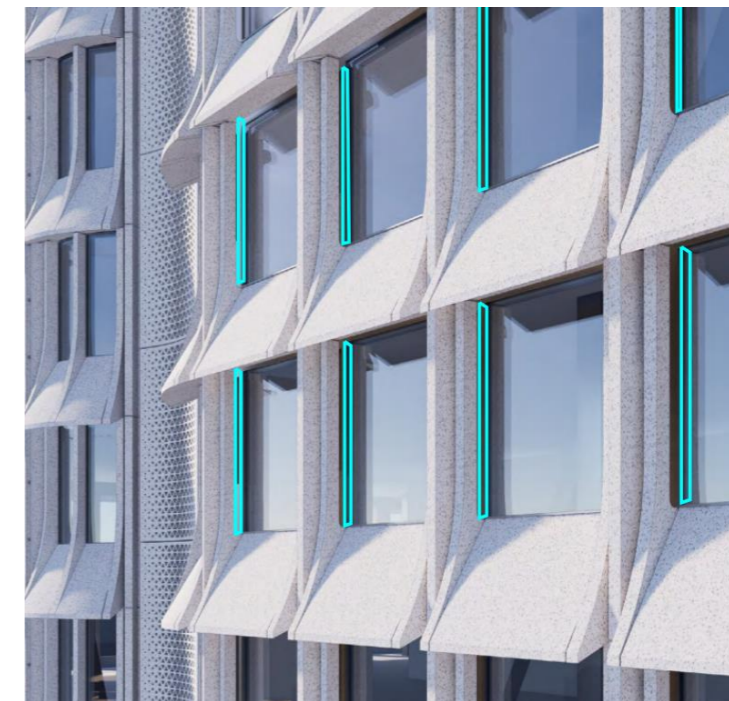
Example of curtain wall façade panels showing solid elements and shadow gaps around glazing for natural ventilation
